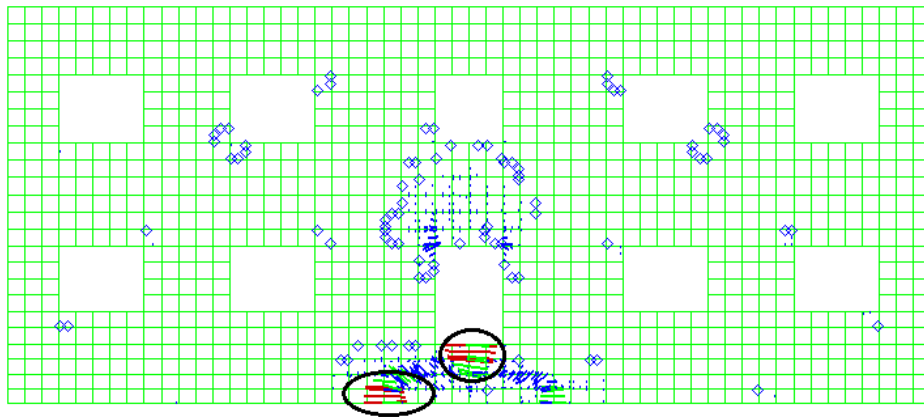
distribution of cracks in 2 story wall, central-door opening, at last excavation stage
